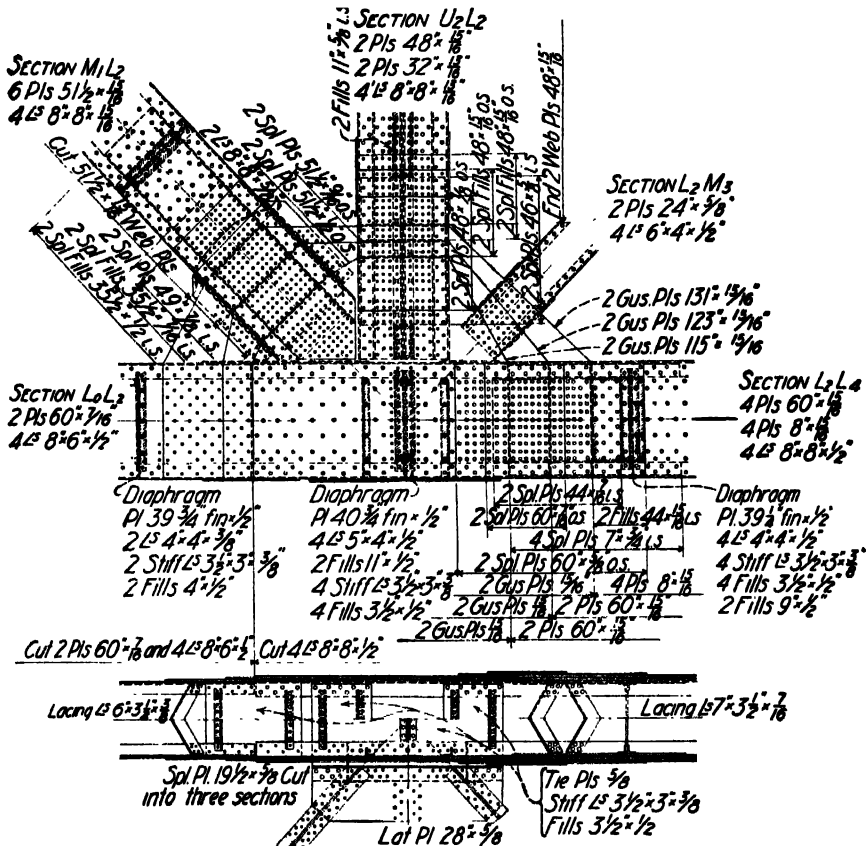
rr. Bottom Chord Joint  $L_2$  of the 423-foot Fixed Spans of the Fratt Bridge over the Missouri River at Kansas City, Mo.
